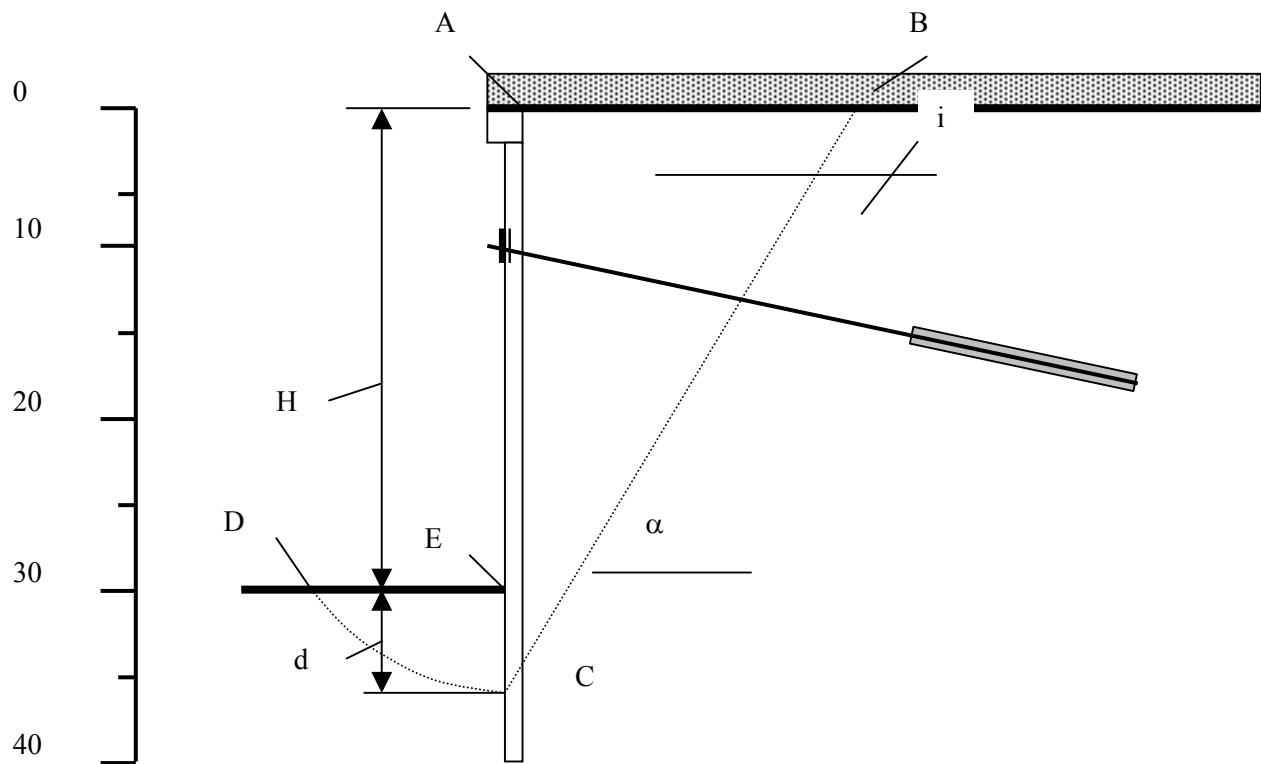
Soletanche wall internal stability, elevation at final excavation stage
